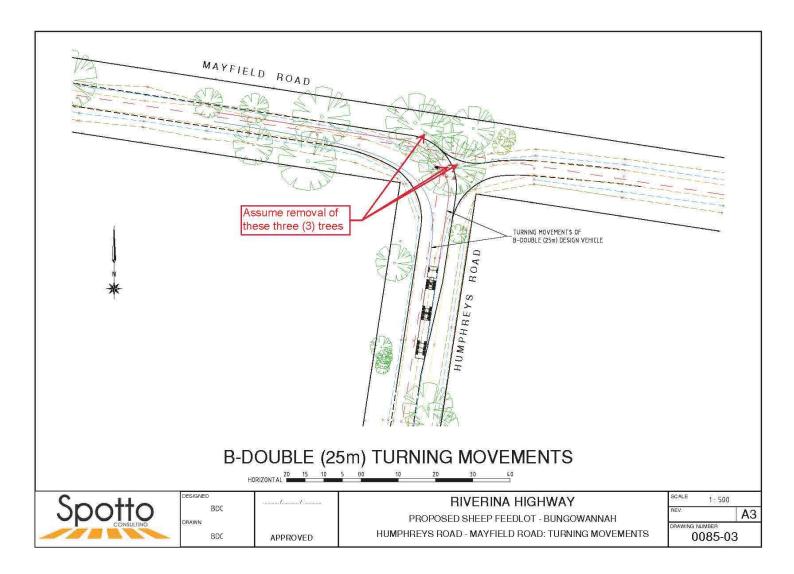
Turning movements plan for B-doubles at the intersection of Mayfield and Humphreys Road (Spotto Consulting dated 17/4/20).
